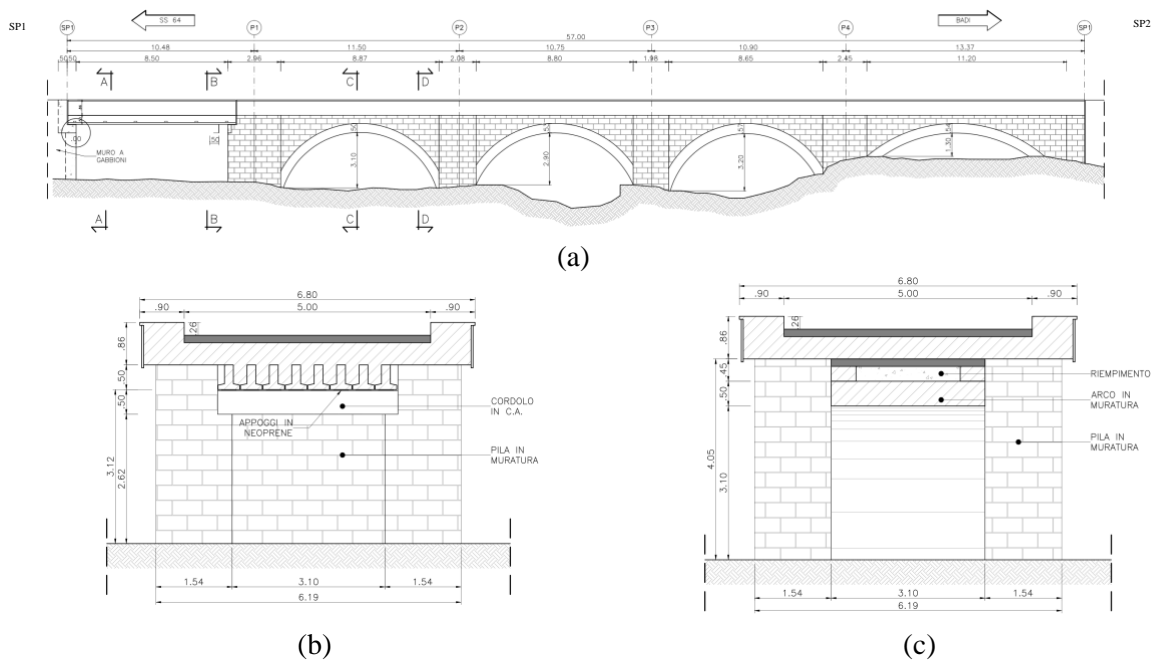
Technical drawings of the Limentra bridge, courtesy of Diamonds srl: (a) elevation view, (b) section B-B, (c) section C-C.
